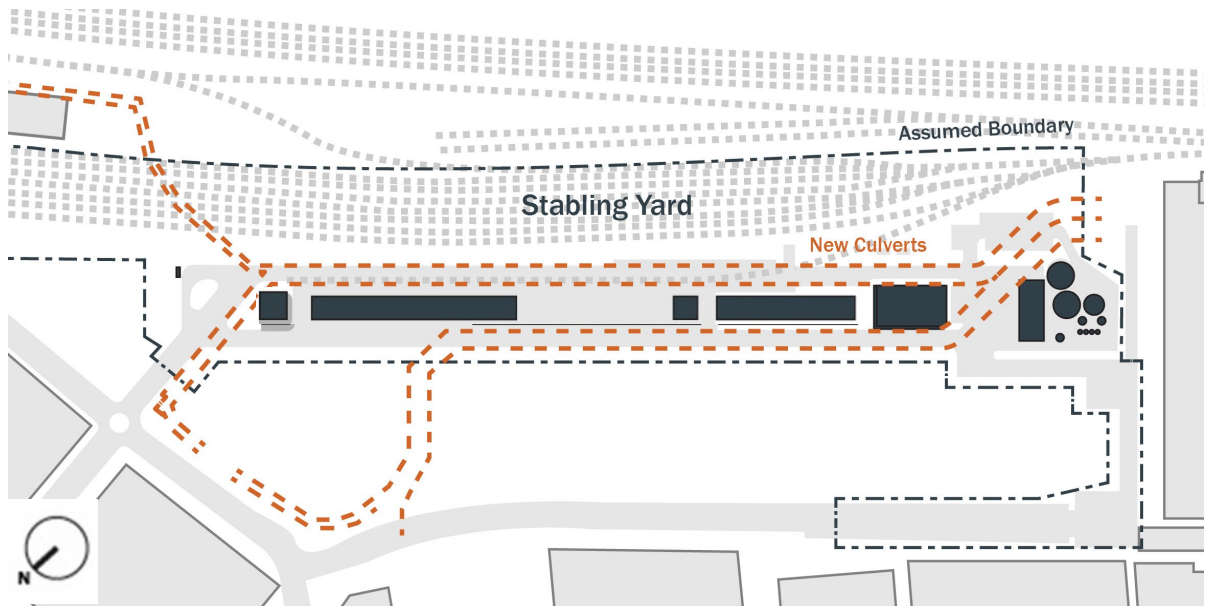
SMTFS and Marrickville Dive – Proposed culverts
